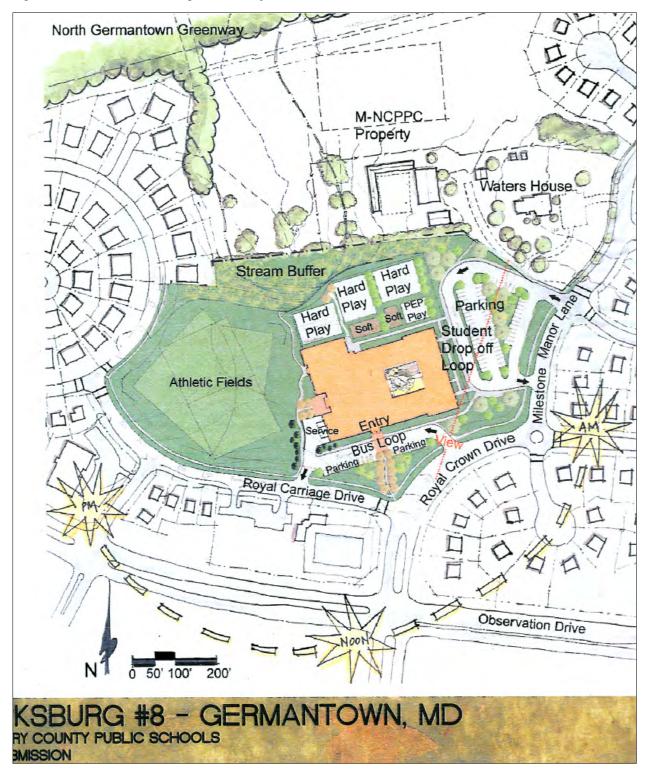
Site Plan, Clarksburg Elementary School No. 8.
